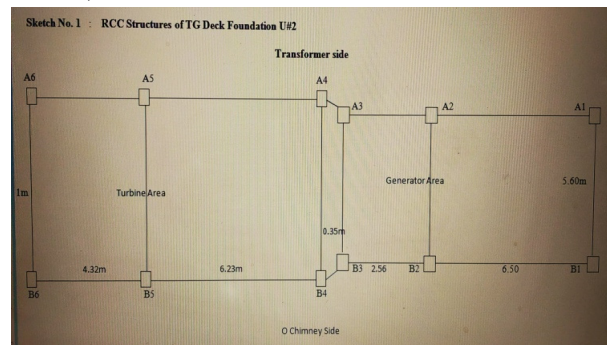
Schematic view - Arrangement of TG Deck RCC Columns
